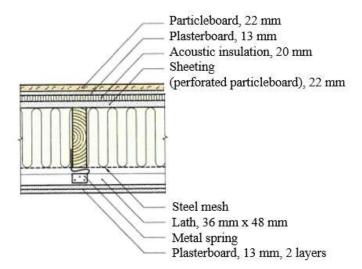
Schematic plan of the floor (SINTEF Certification 2232 2015).
